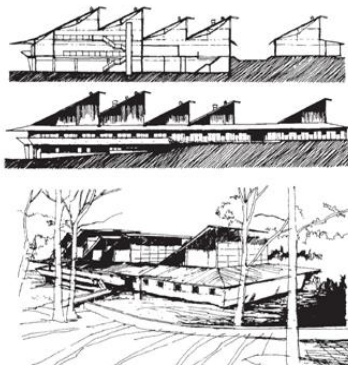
44: Saw tooth roof of The Design Faculty building of Newcastle University (Prasad and Fox, 1996)
